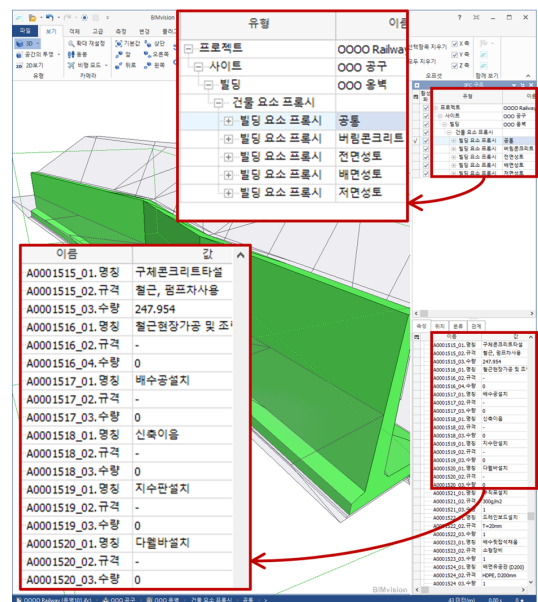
IFC Model of The Reinforced Concrete Retaining Wall Designed by The Parametric Model, LOG=1, LOI=1 (with BIM vision 2.26.3)
